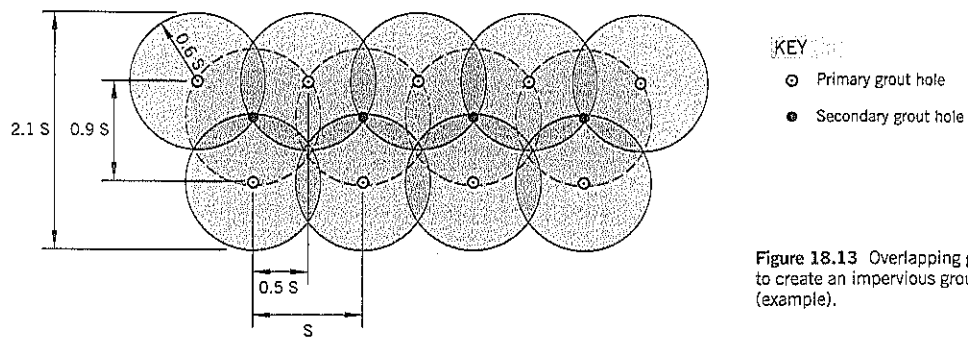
Overlapping grout holes to create an impervious grout curtain (example).
